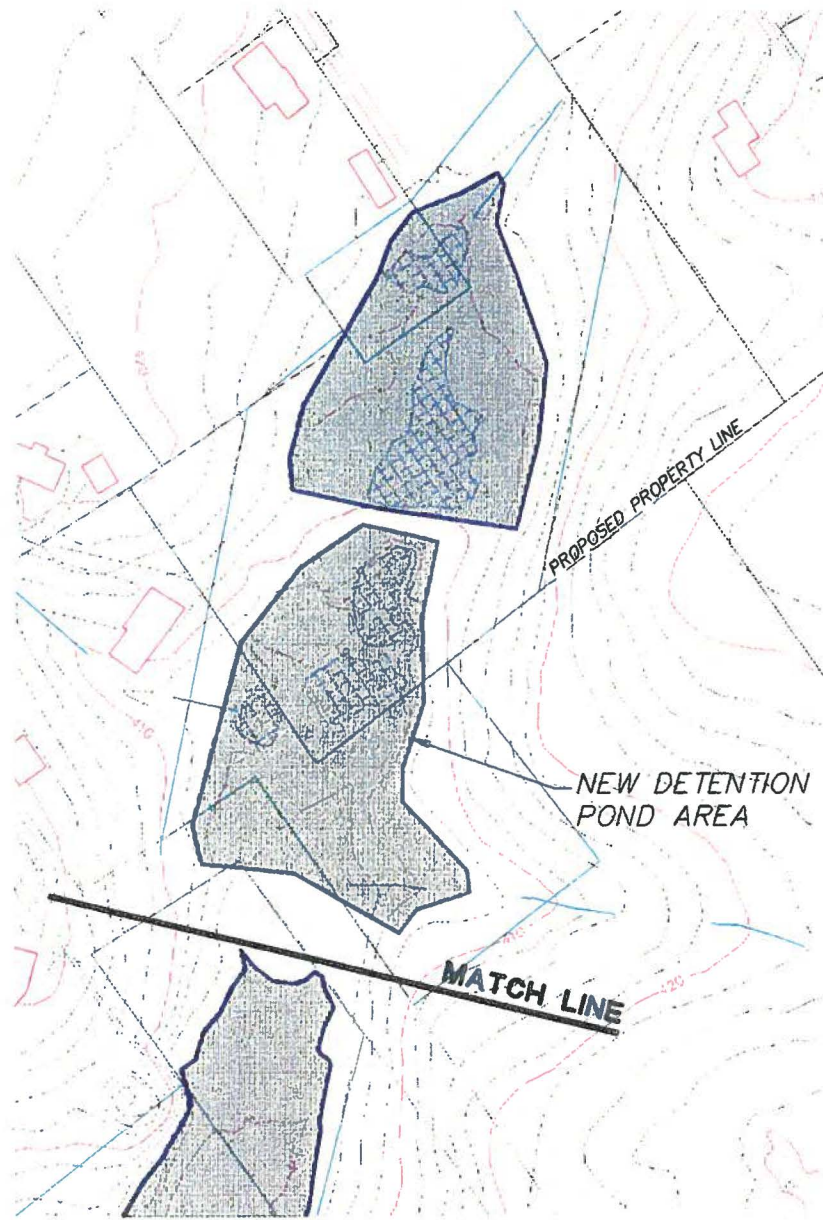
PROPOSED SOUTH END ROAD IMPROVEMENTS
